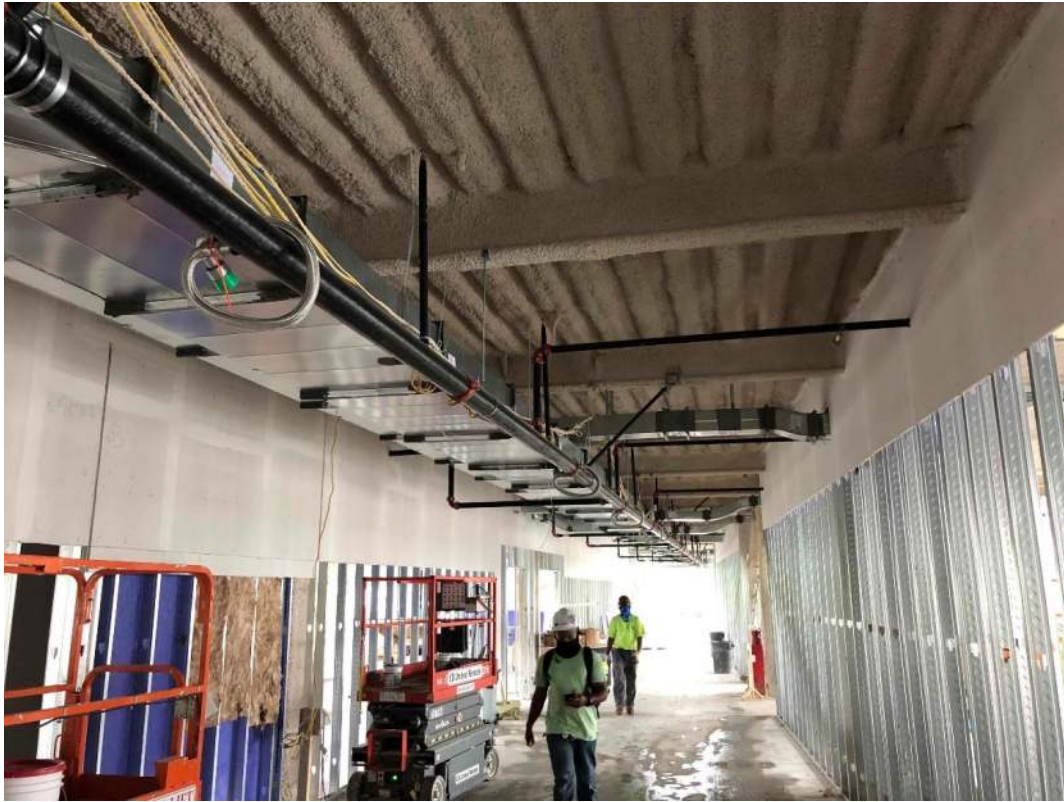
Building A Corridor with MEP components, wall framing, and some sheathing installed.
